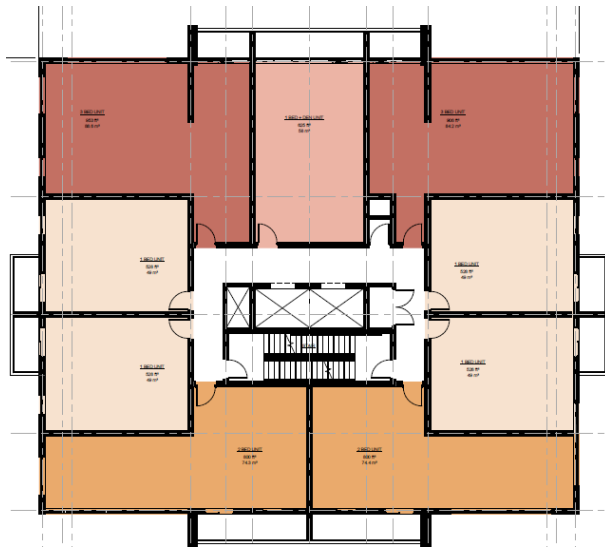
Level 3 Floor Plan (SRM Architects)
